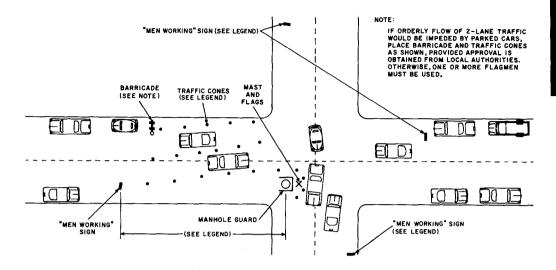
Placement of Warning Devices on City Street Without Truck—Underground Plant in Intersection
